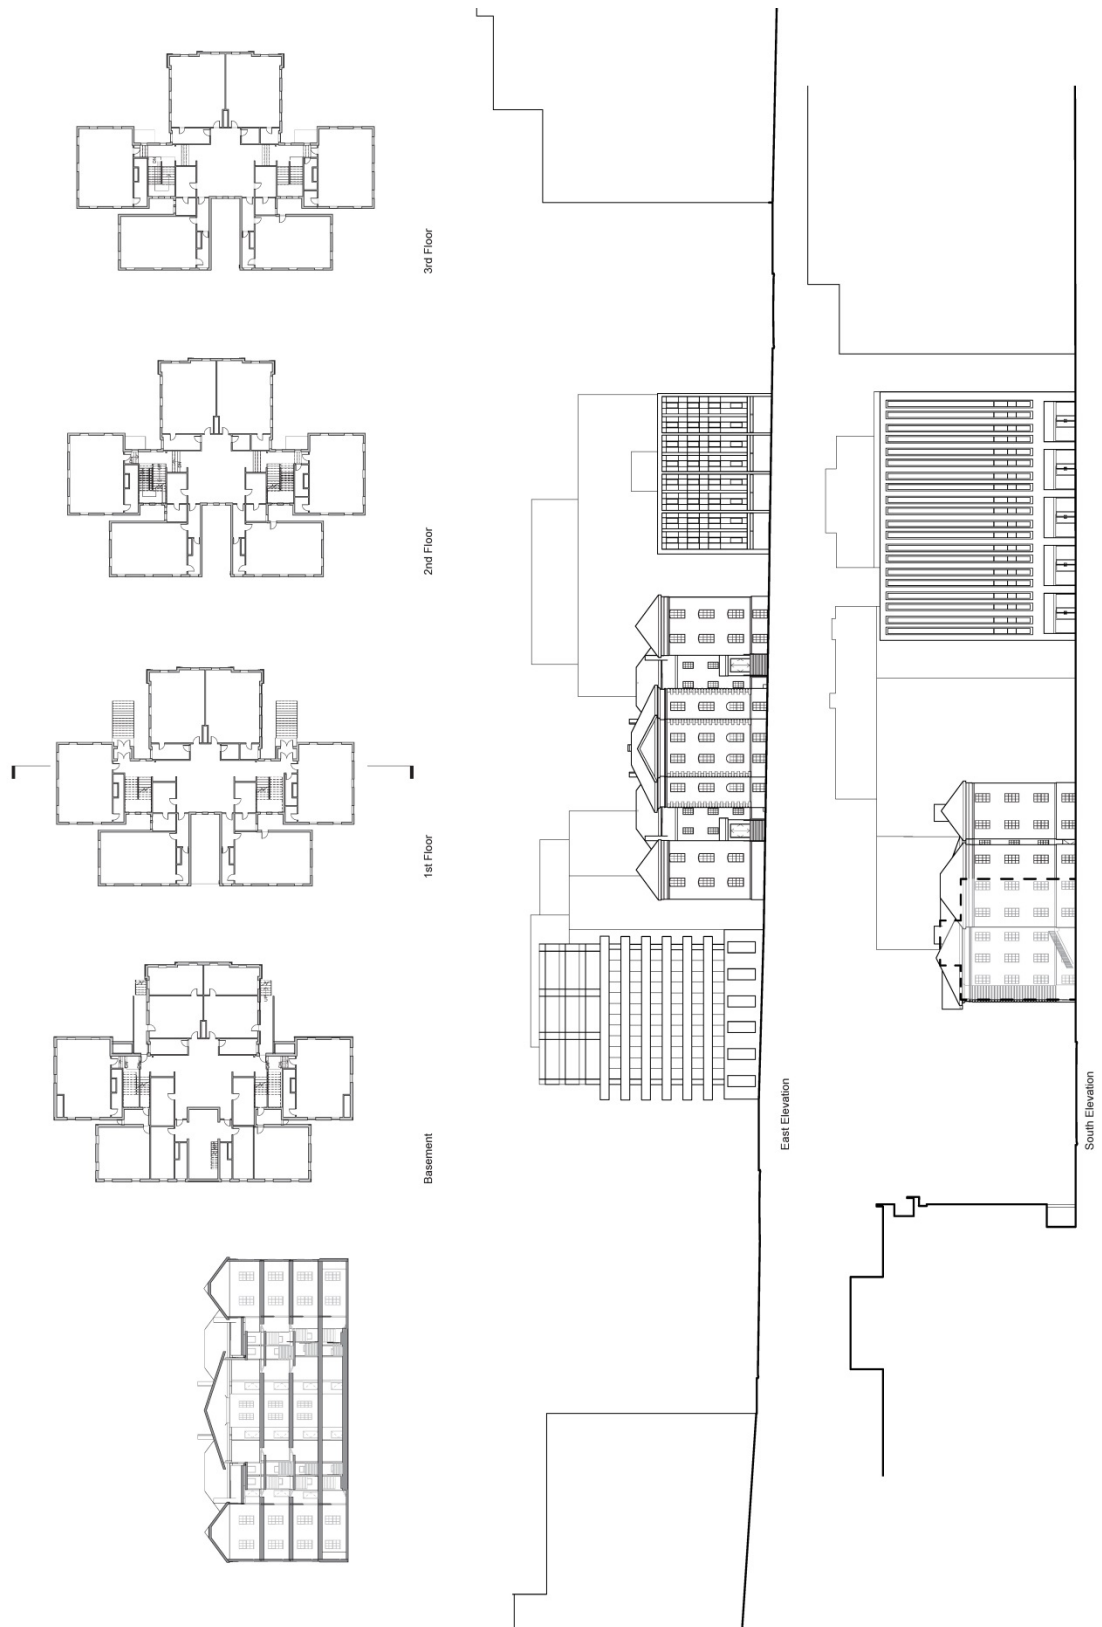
Thaddeus Stevens School, existing building section, plans, east elevation, and south elevation.
